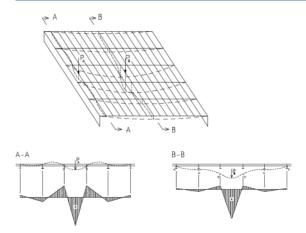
Structural system 3 (Håkansson & Wallerman, 2015)
